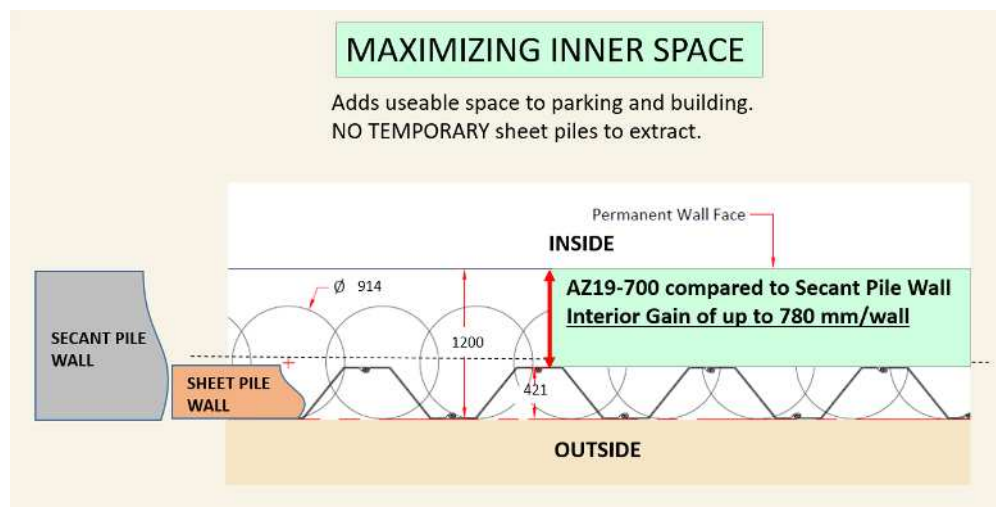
Larger inner space with sheet pile wall than with secant pile wall
